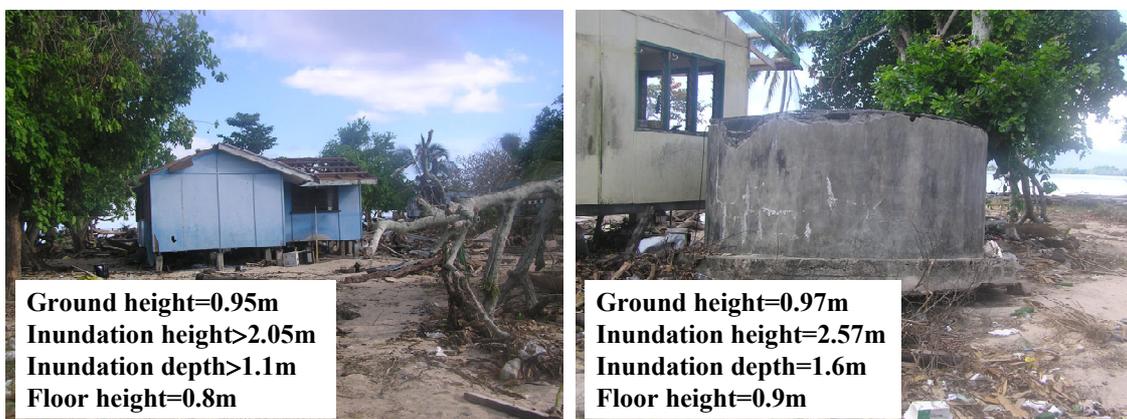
Examples of damage to the houses due to the tsunami in Medical area
